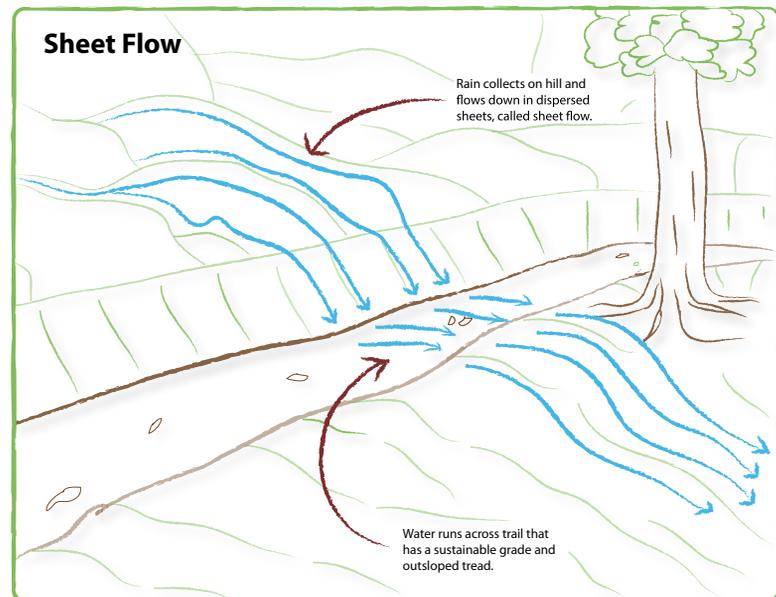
Dispersed sheets of water sheet down the cross slope and should continue across the trail for minimal damage.
